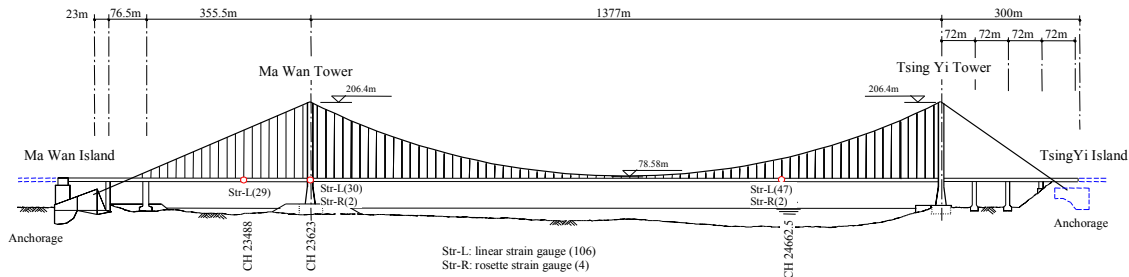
Tsing Ma Bridge and sections instrumented with strain gauges
